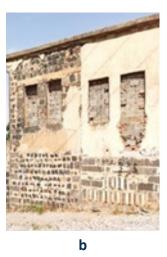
Deterioration and damage to the walls (Işık, 2021)
